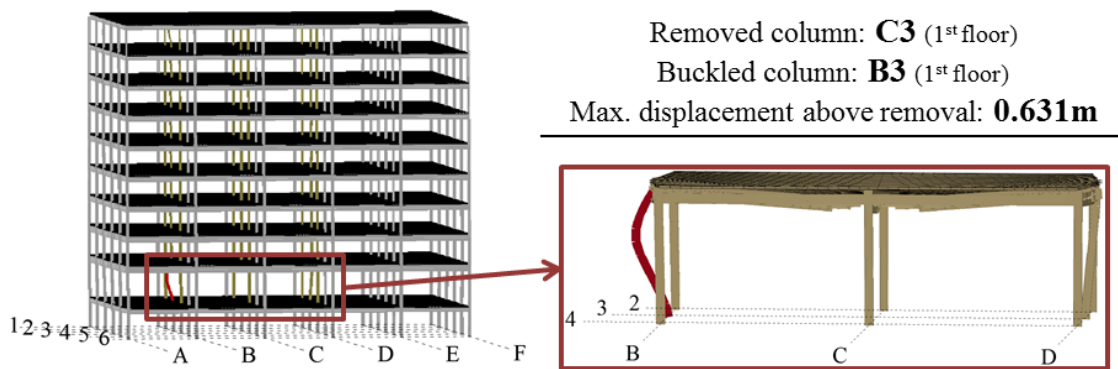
Deformed shape of structure – 1st floor column removal scenario
